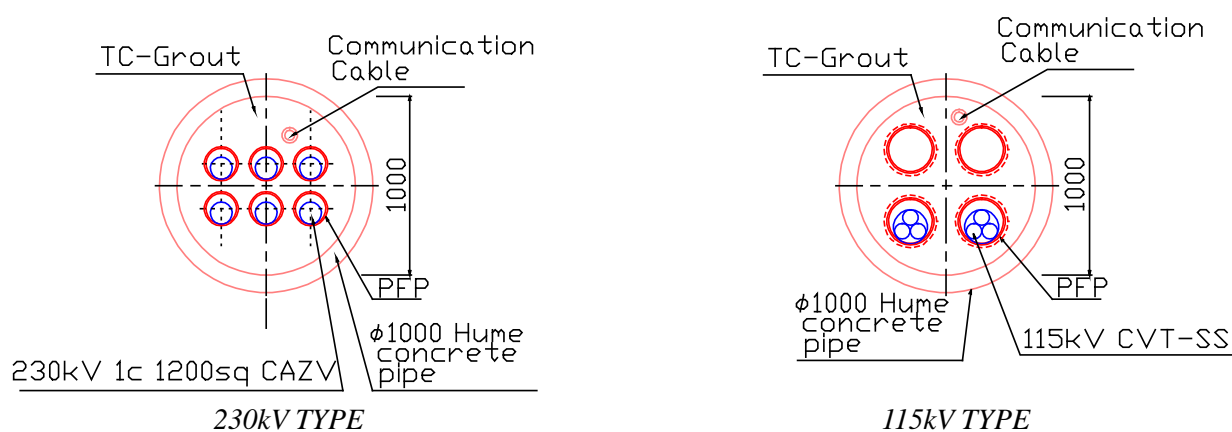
Standard Cross-sectional Drawing (Duct Bank Method)
